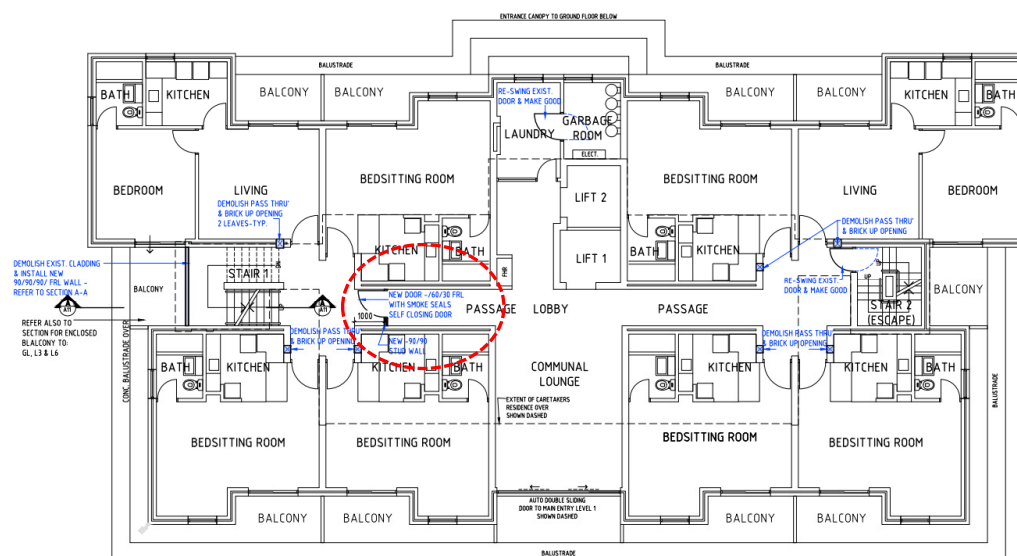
New Enclosure to Staircase (Ground Floor Level)
